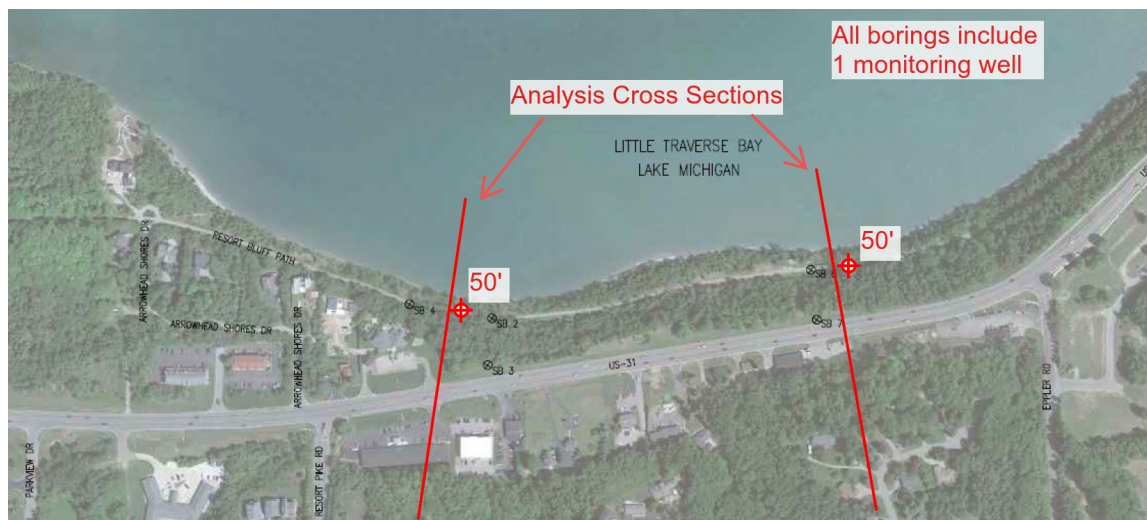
Preliminary Geotechnical Investigations Plan & Approximate Proposed Boring Locations
